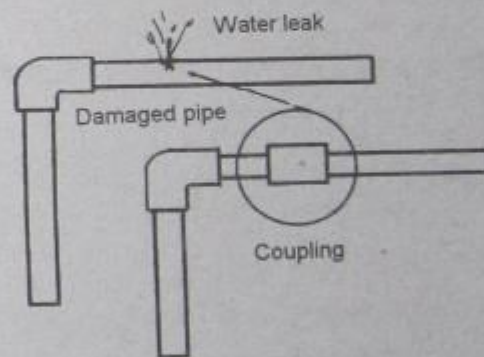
REPAIRING DAMAGED PLASTIC PIPE
